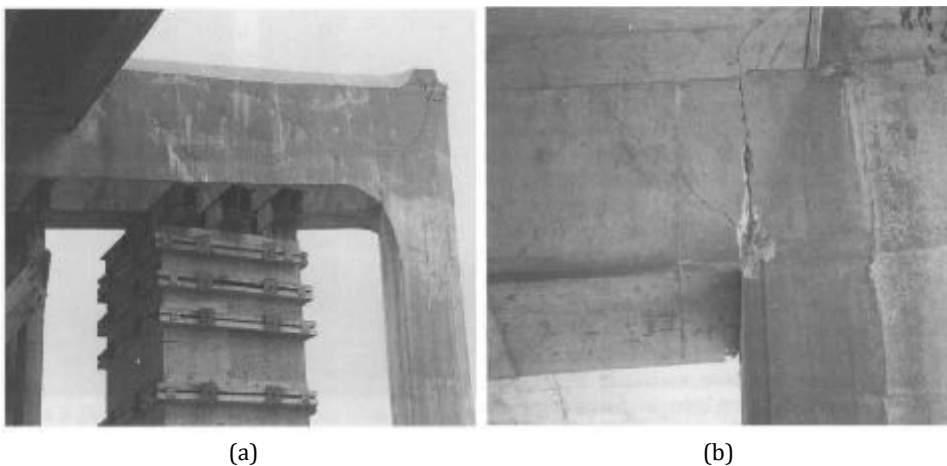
Cap beam failure due to the 1989 Loma Prieta earthquake: (a) flexure and shear and joint failures, I-280 China Basin viaduct, (b) Cap beam positive moment cracks at inner column face.
